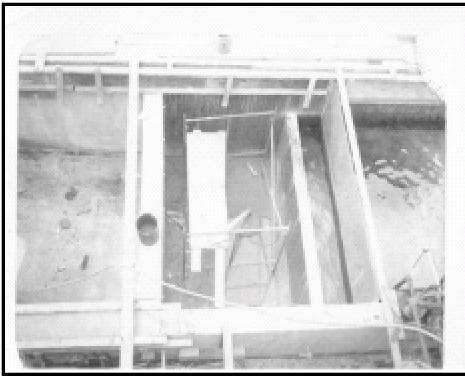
View looking north from WWTP roof at new Precipitation tank.
